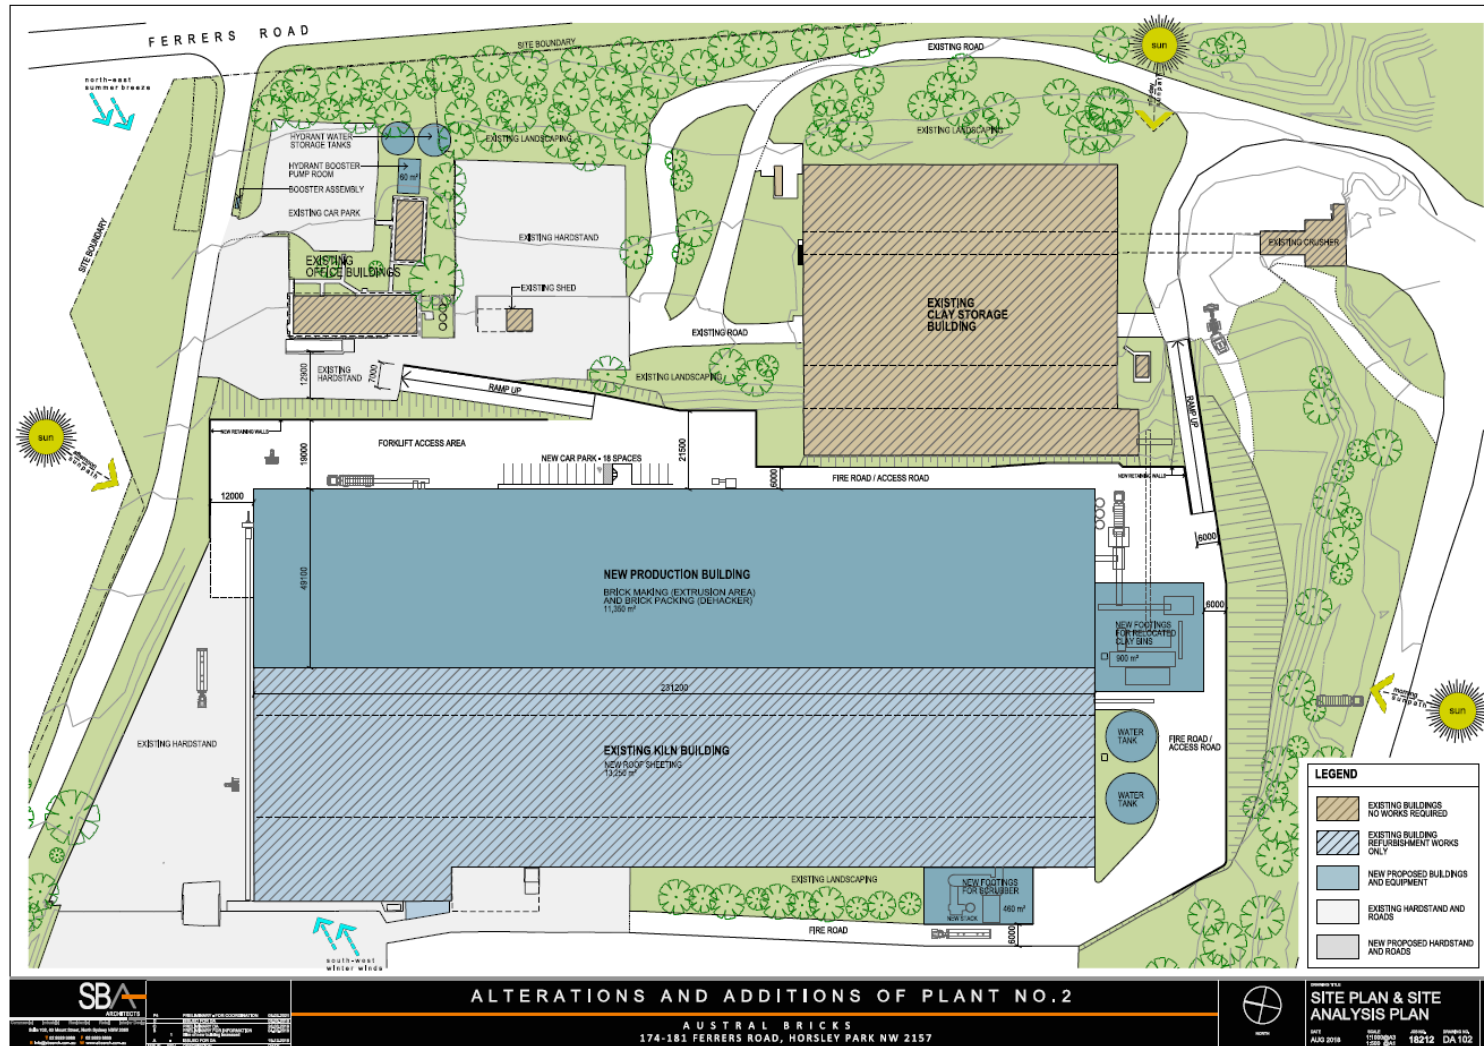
Site Plan – Alterations and Additions of Plant 2 (Figure 2 of 2)
